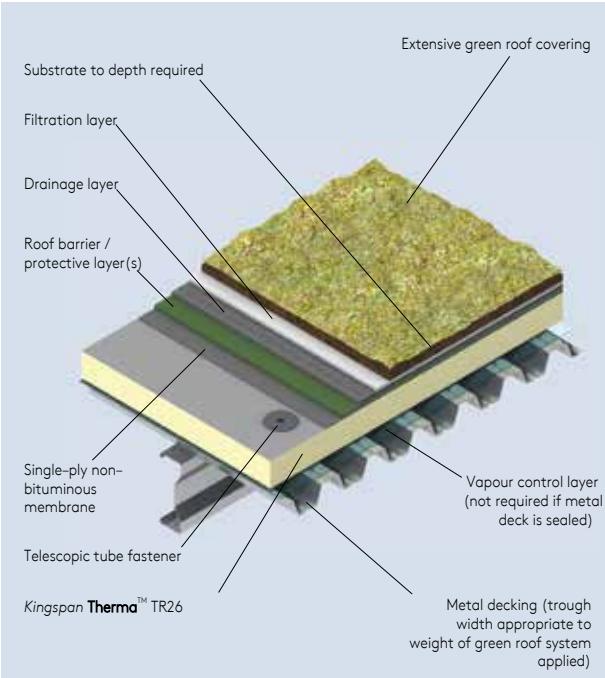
Kingspan Therma™ TR26 in an Extensive Green Roof Covering – Metal Deck with No Ceiling.
